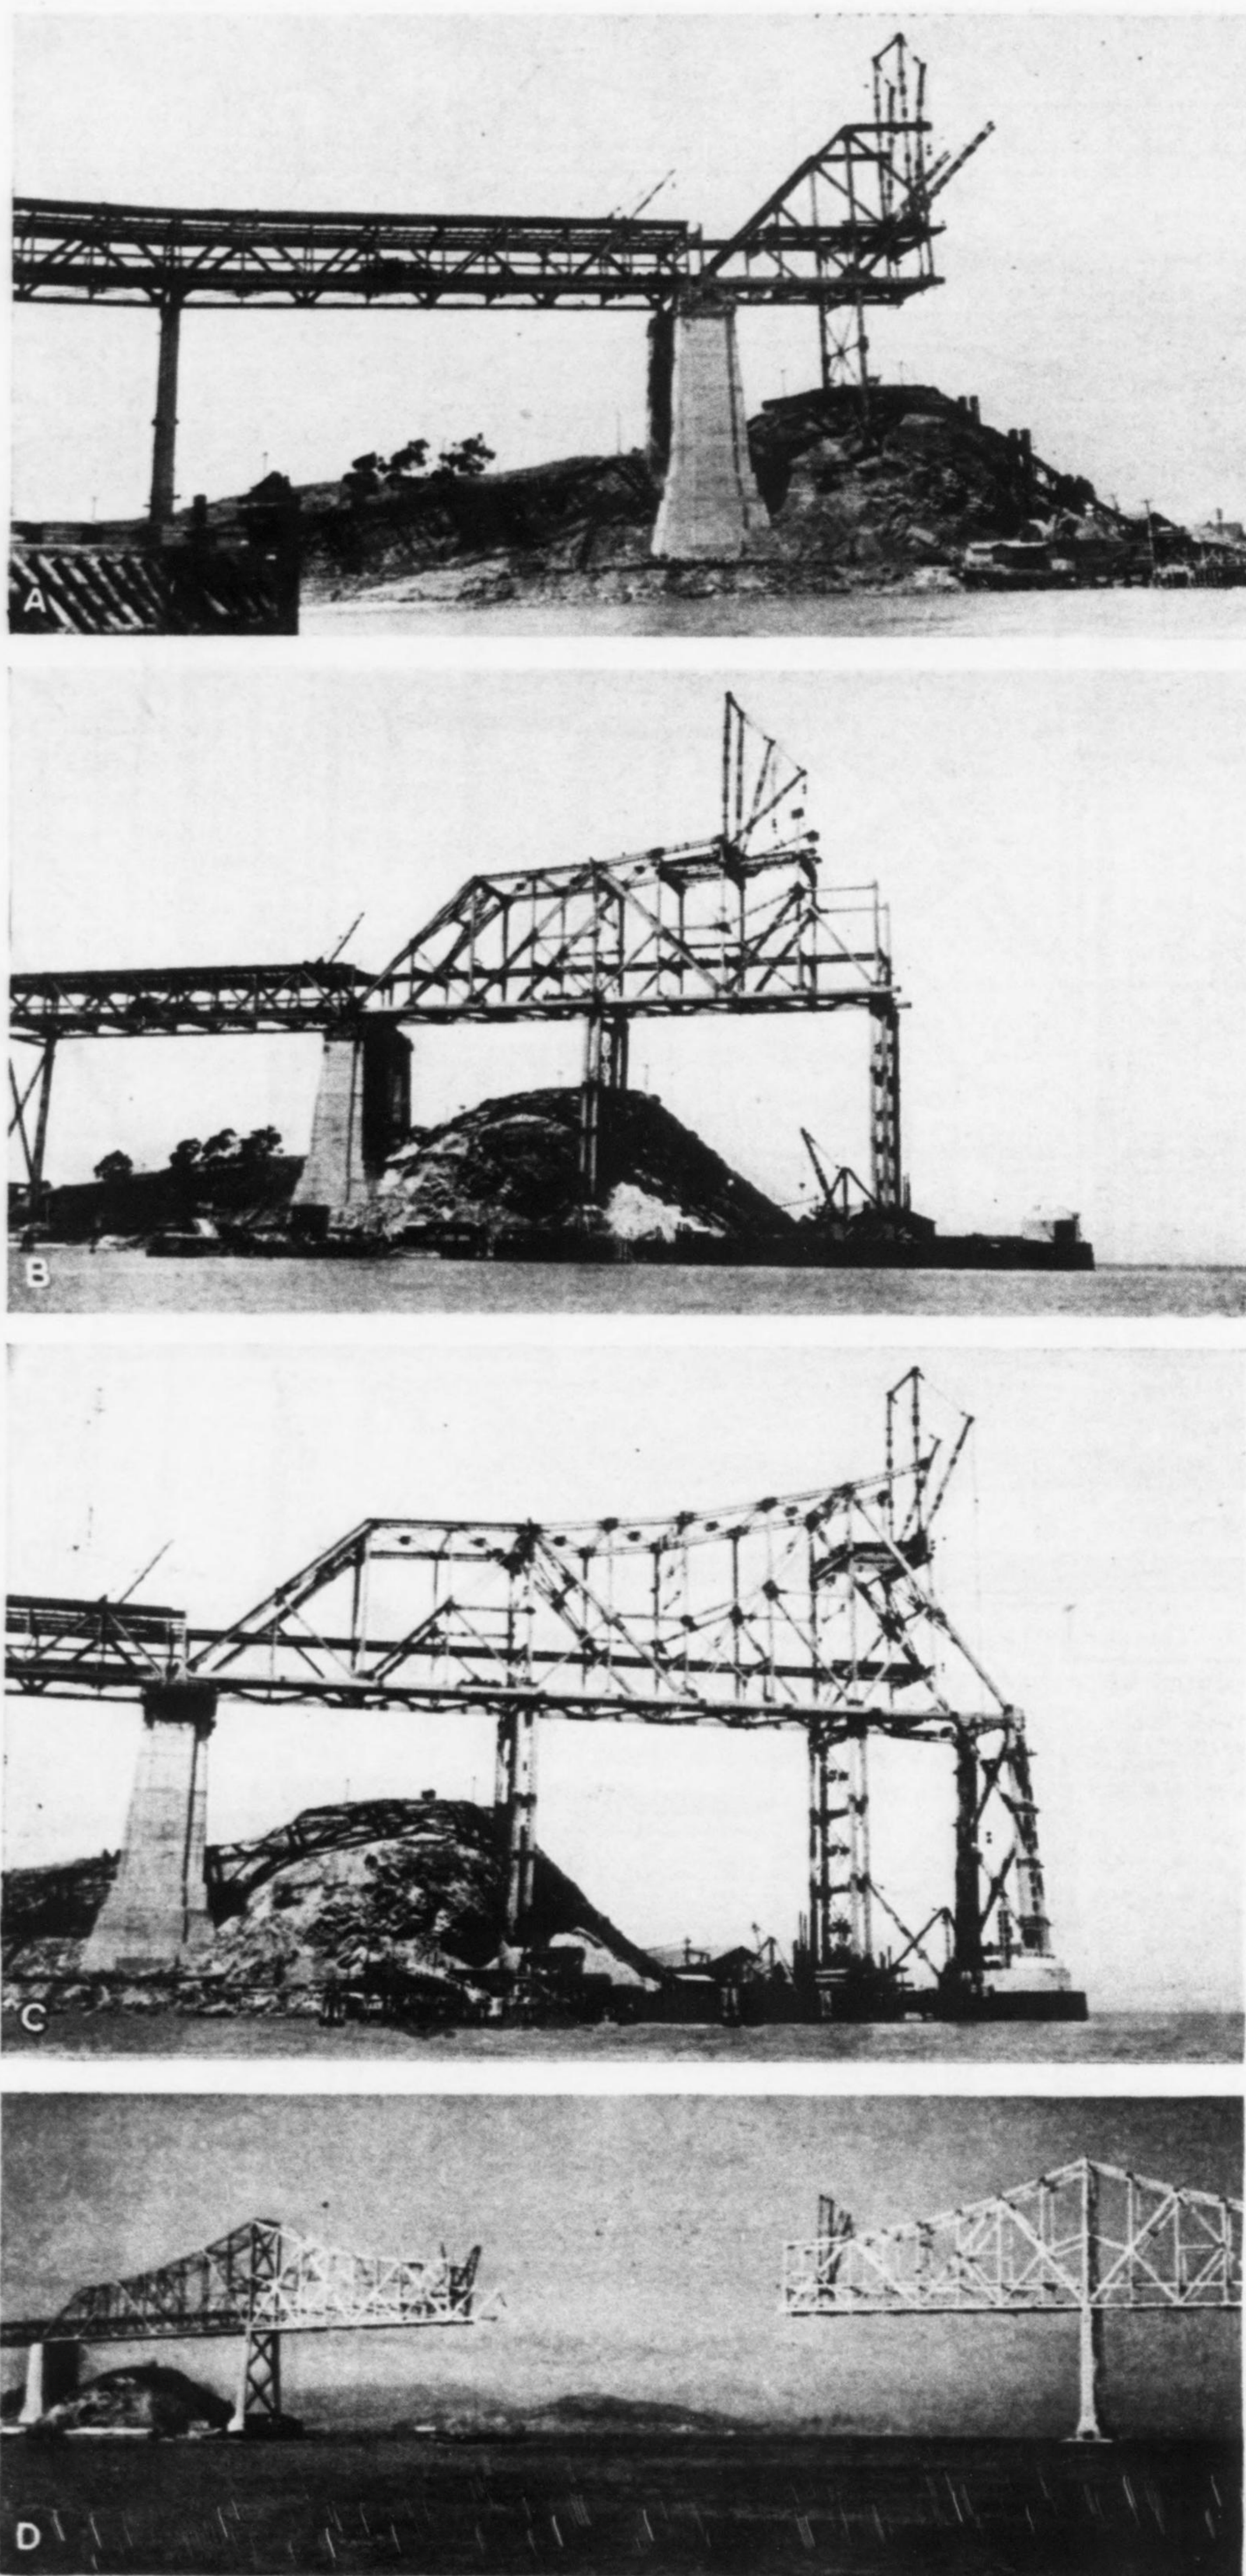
SUCCESSIVE STAGES in erection of cantilever span: A—Start of west anchor arm. B—West anchor arm traveler at upper level. C—Permanent tower E-3 being erected by the traveler. D—Start of erection of suspended span.
